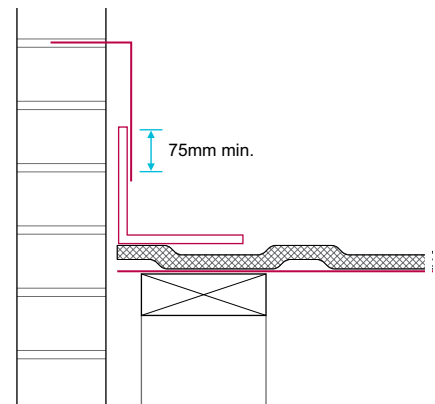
Timber frame interface with concrete or masonry communal areas — before movement
